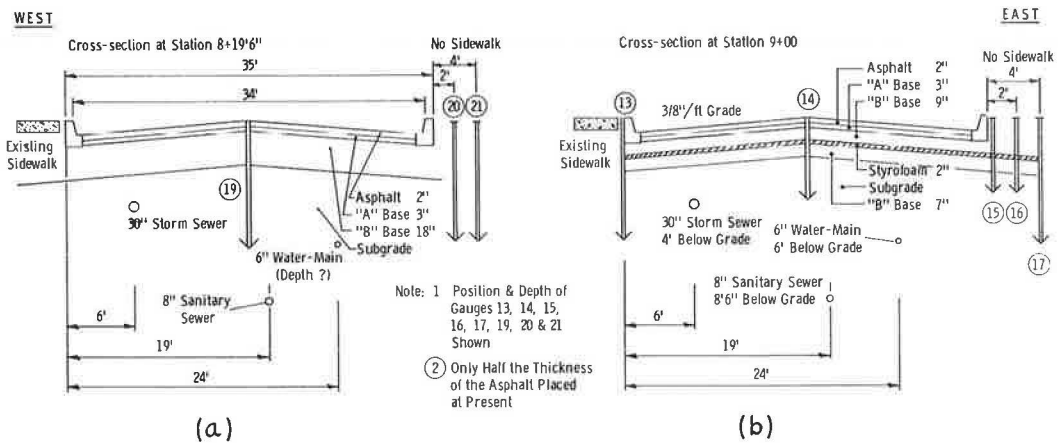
Cross-section of insulated and control areas on Byng Street showing pavement structure and locations of frost-depth gages.
